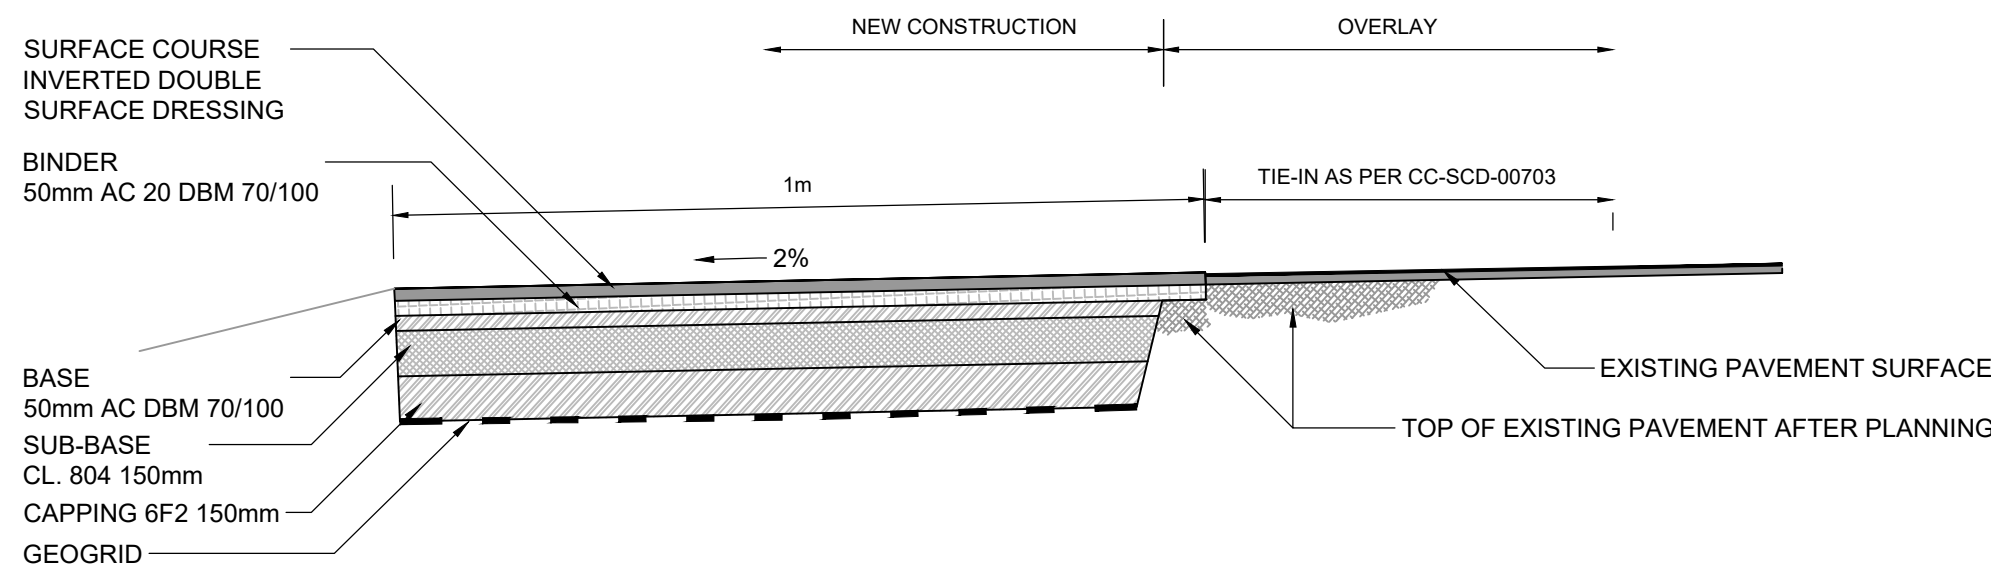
DETAIL A: BOUND PAVEMENT DETAIL AND CYCLE TRACK
